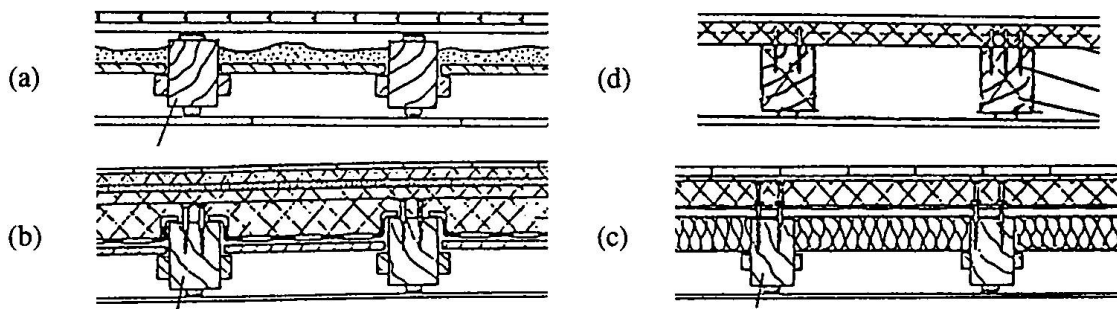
Typical traditional timber floor (a) and three types of refurbishment as timber-concrete composite slabs using the existing planks (b) or a new timber board (c) or steel deck (d)
